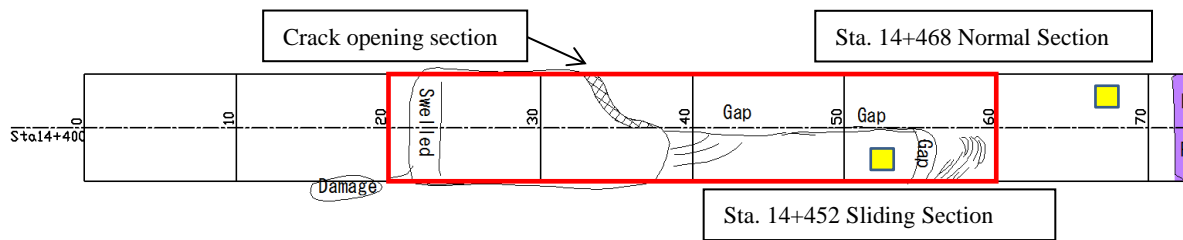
Measurement of Sliding Surface at Steep Section
